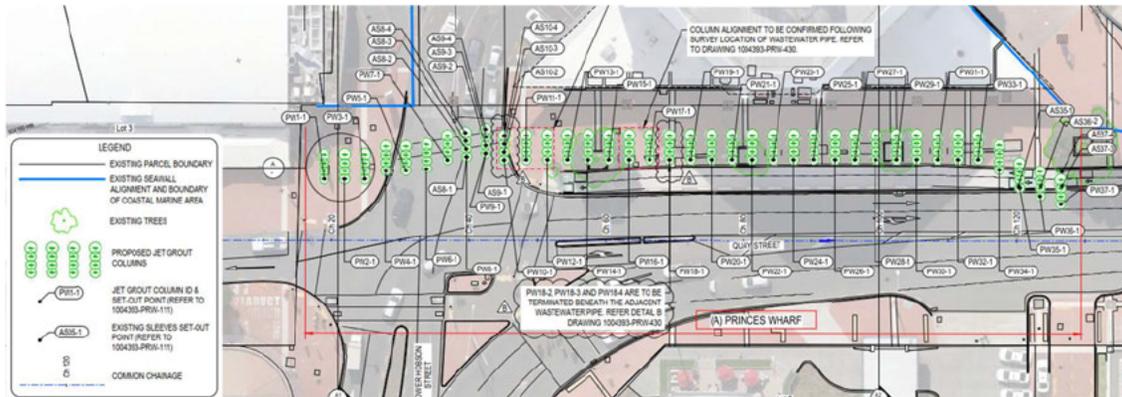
Quay Street Seawall strengthening layout drawing for Princes Wharf section
